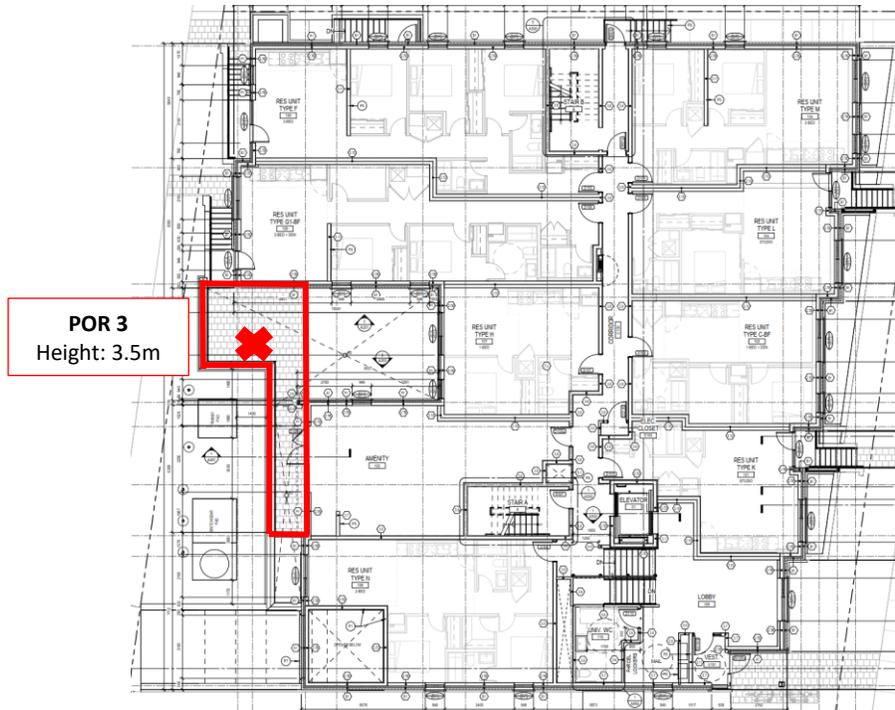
Floor Plan of the Level 1 patio Outdoor Living Area (POR3) of 10-20 Empress Ave. The space associated with the POR is outlined in red. The red 'X' denotes the receiver location used in STAMSON.
